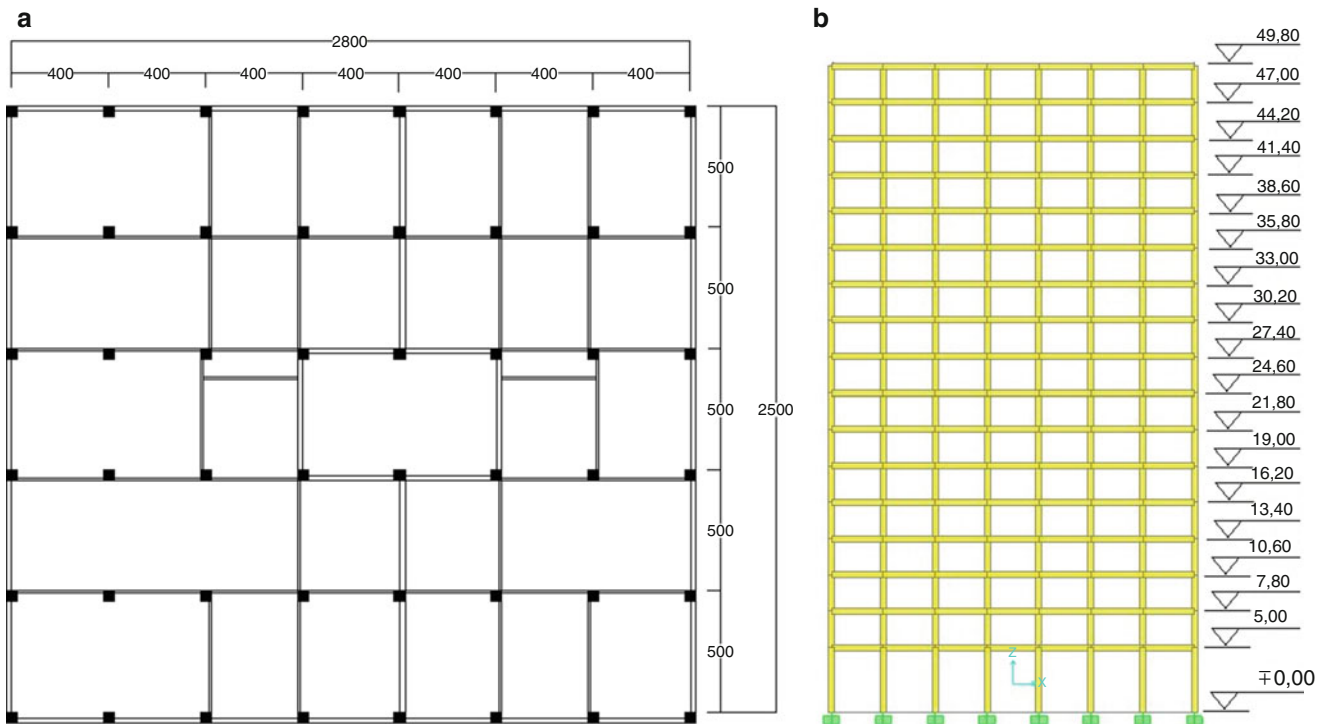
(a) Plan view (cm); (b) lateral view (m)
